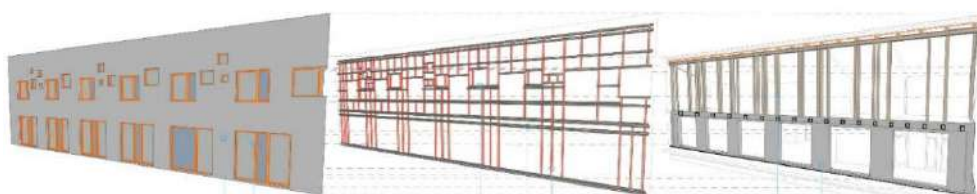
Improved renovation of kindergarten, 3D view - facade diagram according to TES principles. Source: authors
